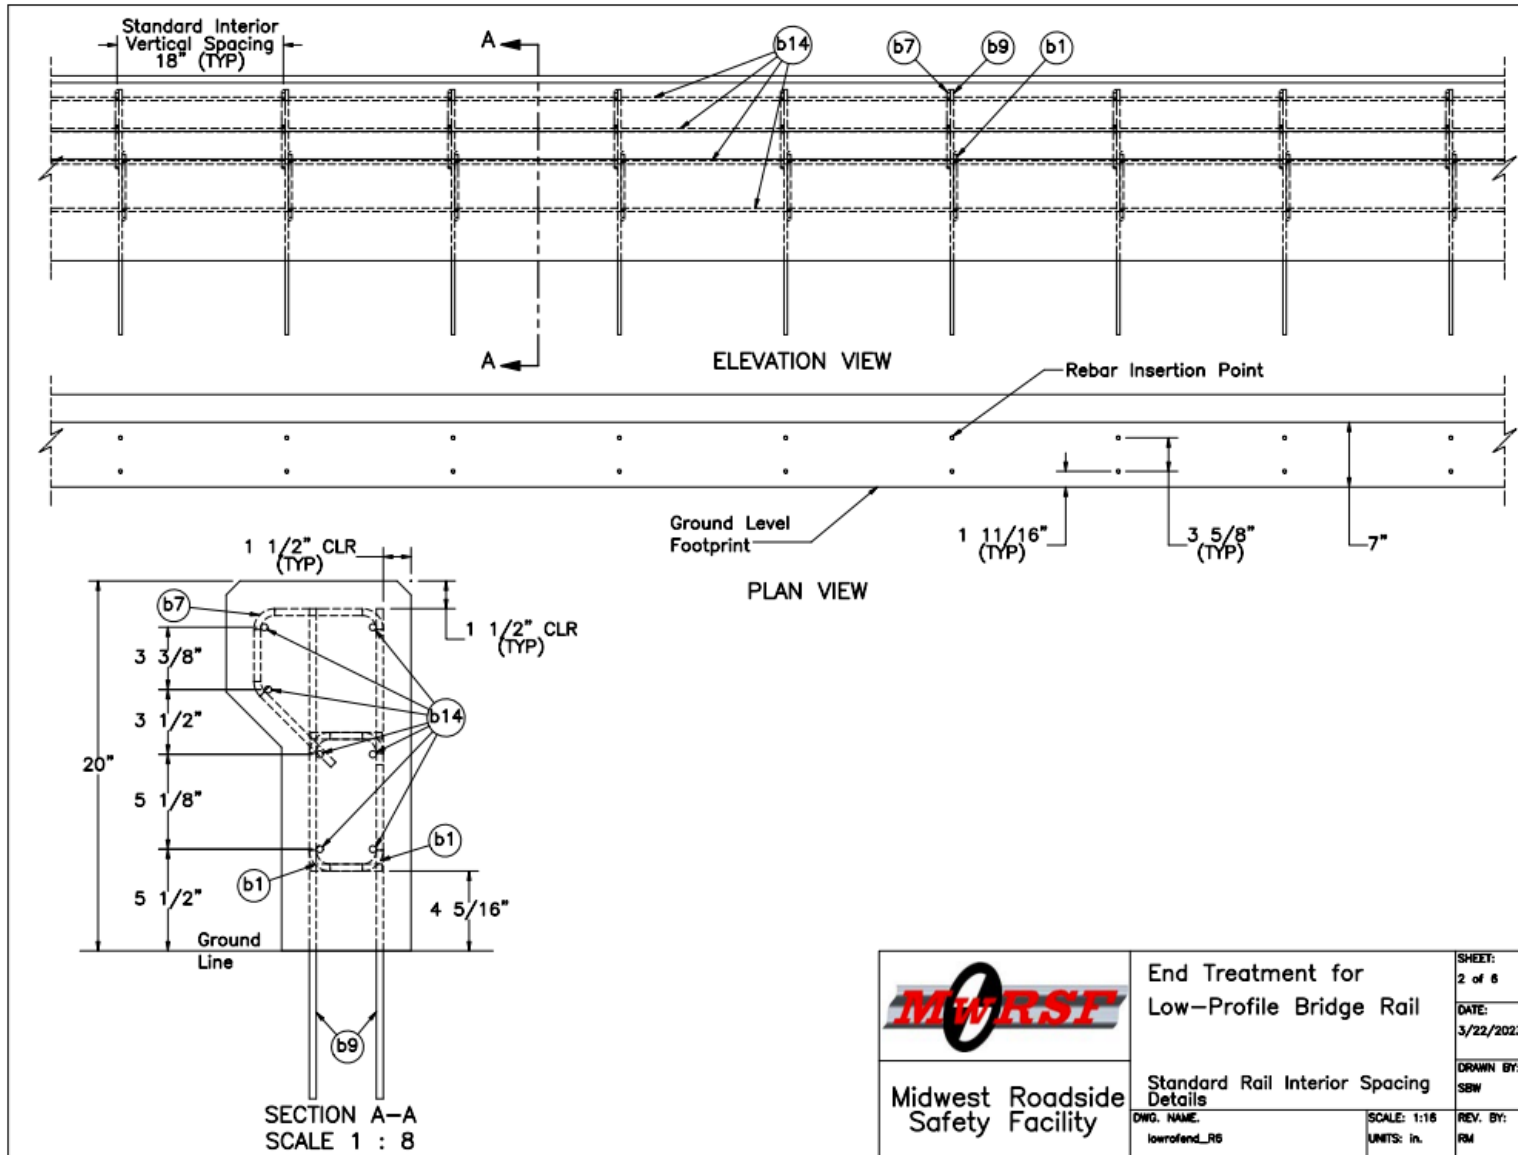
Modified NDOR Bridge Railing System, Standard Rail Interior Spacing Details
